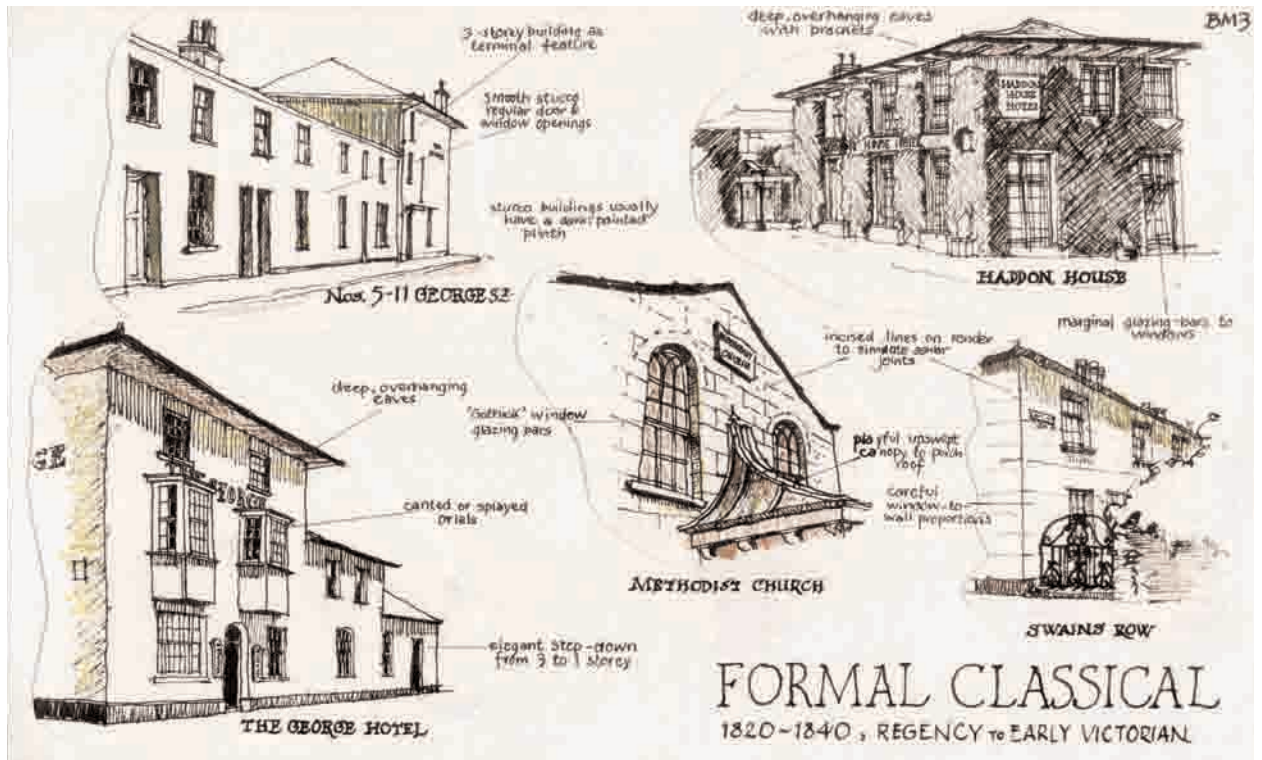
'Formal Classical Style' - regular terraces of rendered 2 storey houses with vertical sash windows and square-headed door openings, for example, Nos. 5-11 George Street.
